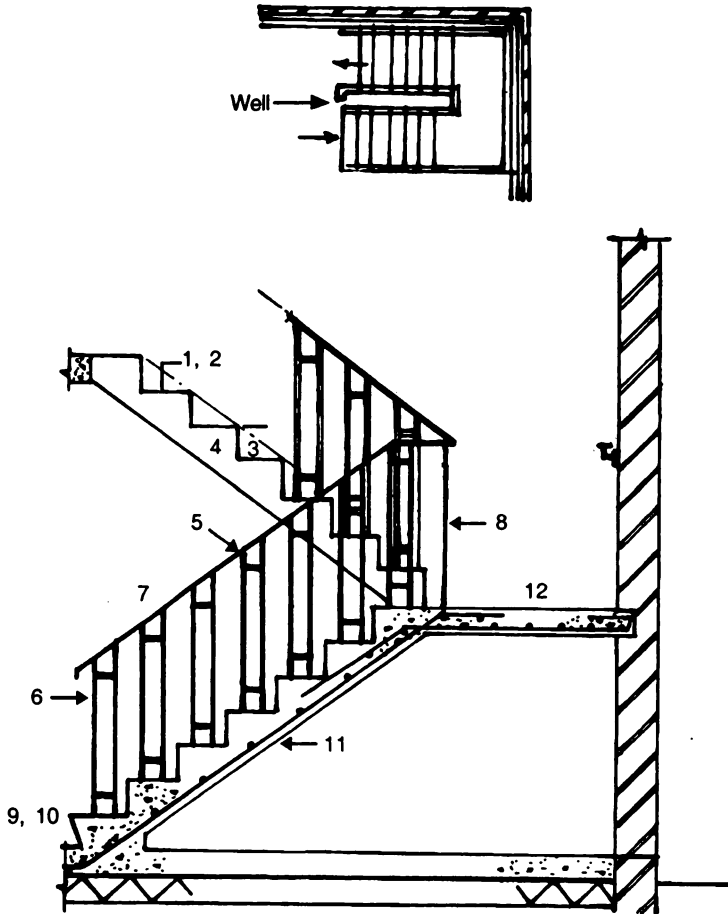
Cast-in-situ reinforced concrete doglegged half-turn stairs: 1. Tread, 2. Going, 3. Riser, 4. Rise, 5. Handrail, 6. Baluster, 7. Balustrade (baluster and handrail), 8. Newel, 9. Nosing, 10. Scotia (moulding under nosing), 11. Soffit, 12. Landing.
